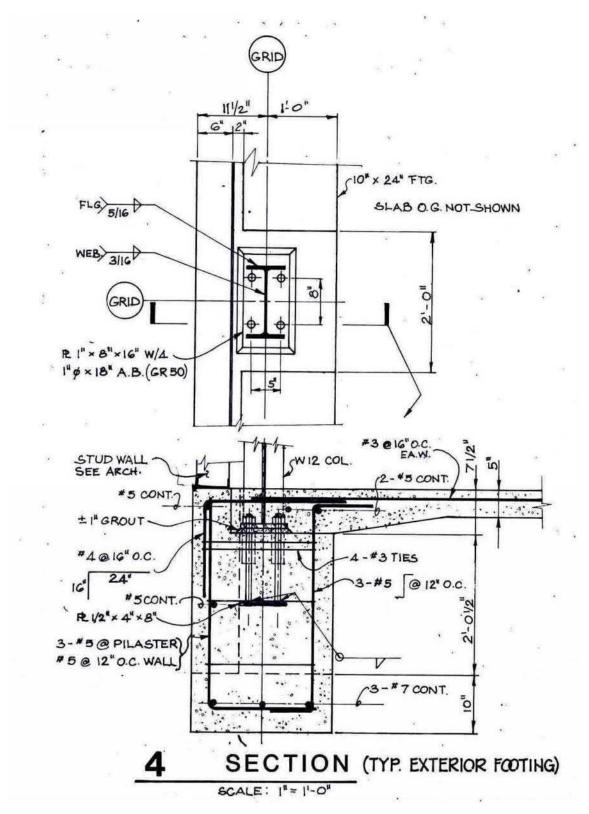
Hospital – Steel Columns (Section 4/S-7)
